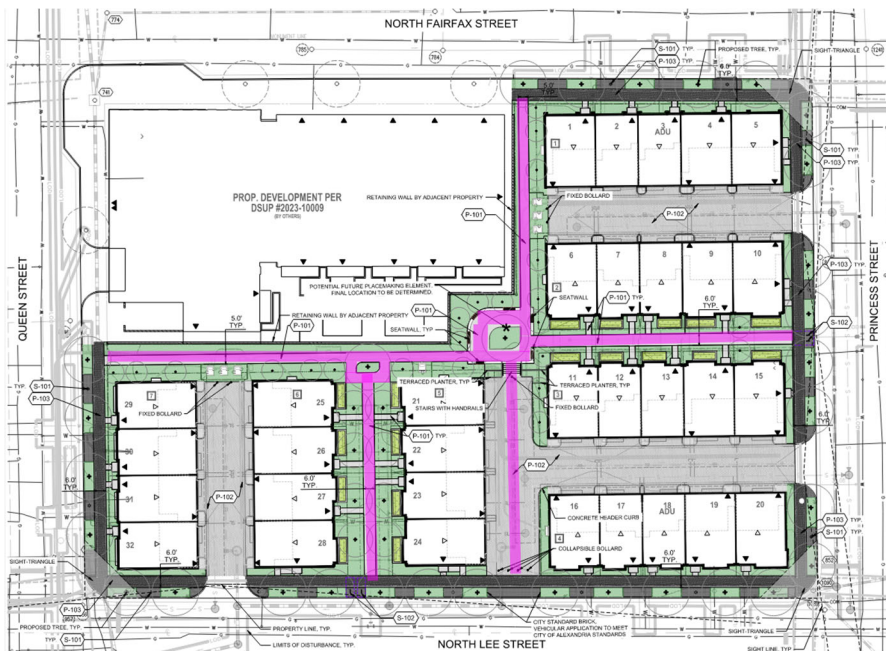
Public access into and through the site (see walkways and parking court in magenta).
